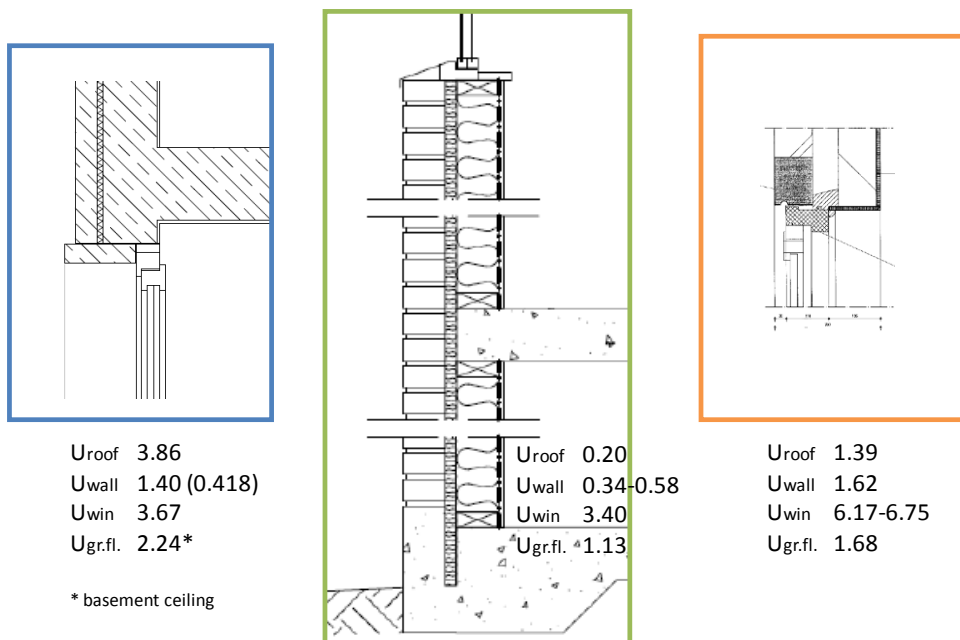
Building envelope before retrofit: Original wall types in (from left) Paris, Alingsås, Delft buildings. Regarding Paris, the wall U value within brackets refer to the supplementary insulated backyard façade.
